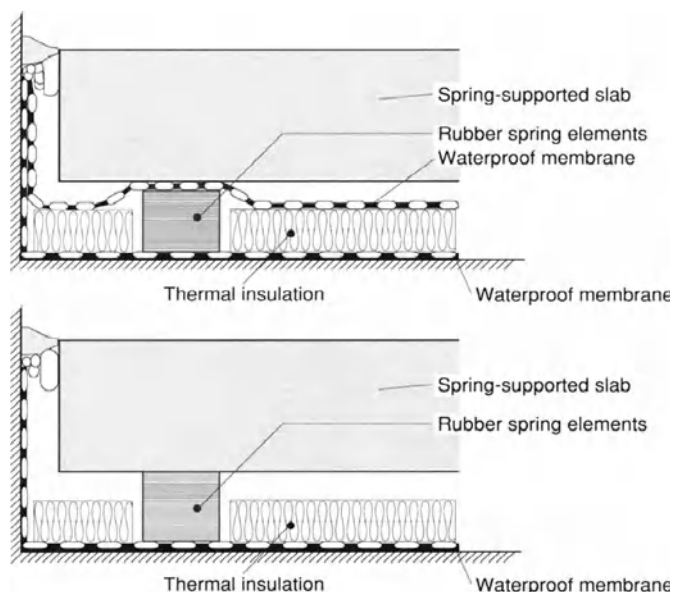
Spring-supported slab structure with a waterproof membrane on the sub-structure [4.2]
